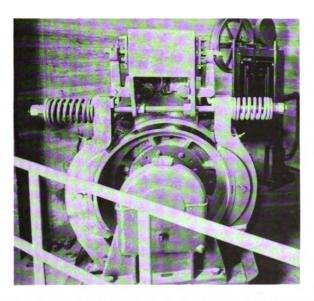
Elevator hoisting machine showing braking arrangement—Cherokee.
